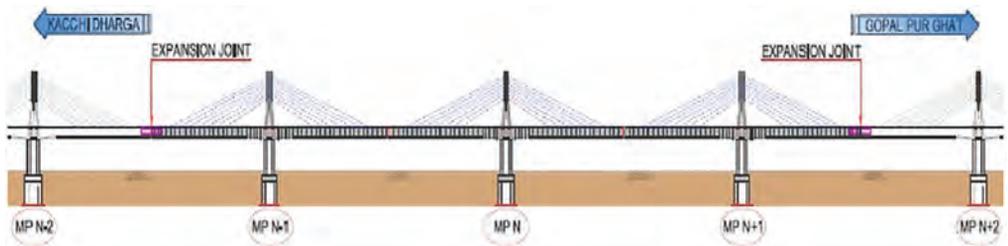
Installation of the expansion joint. 2. Installation of the wearing surface and road
